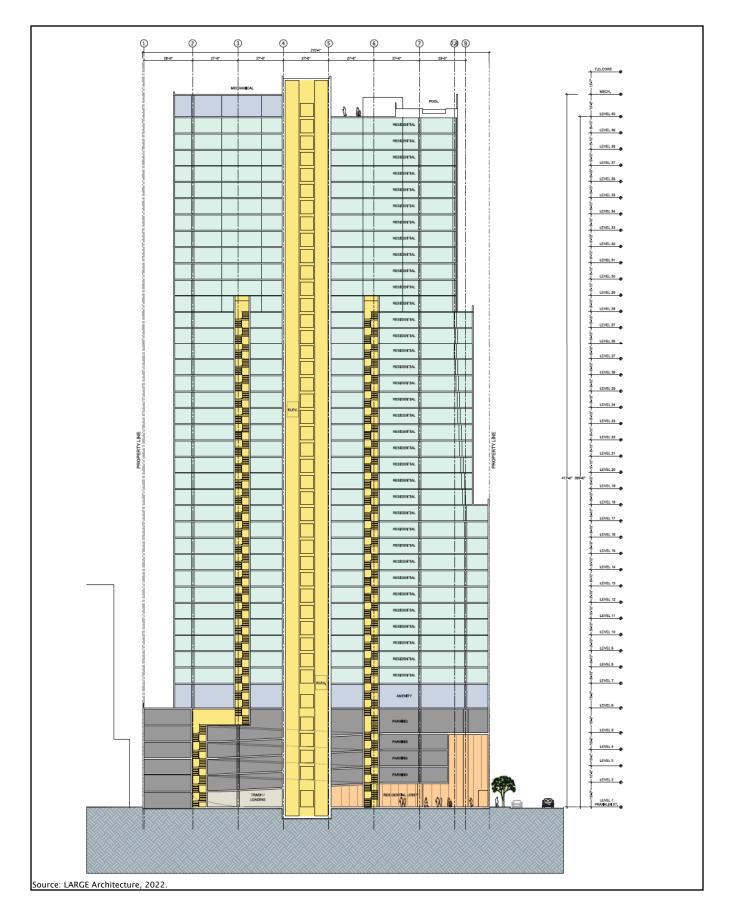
Project Site Section –1431 Franklin Street Residential Project
